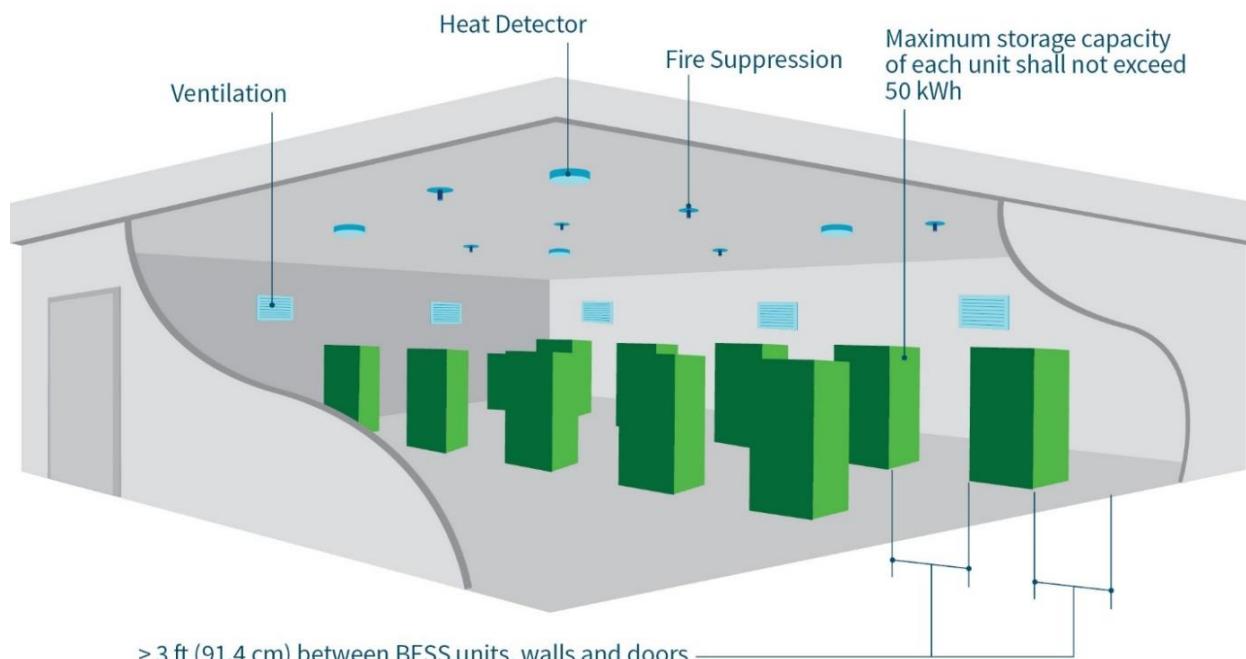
Dedicated Use Building BESS Installation Requirements
